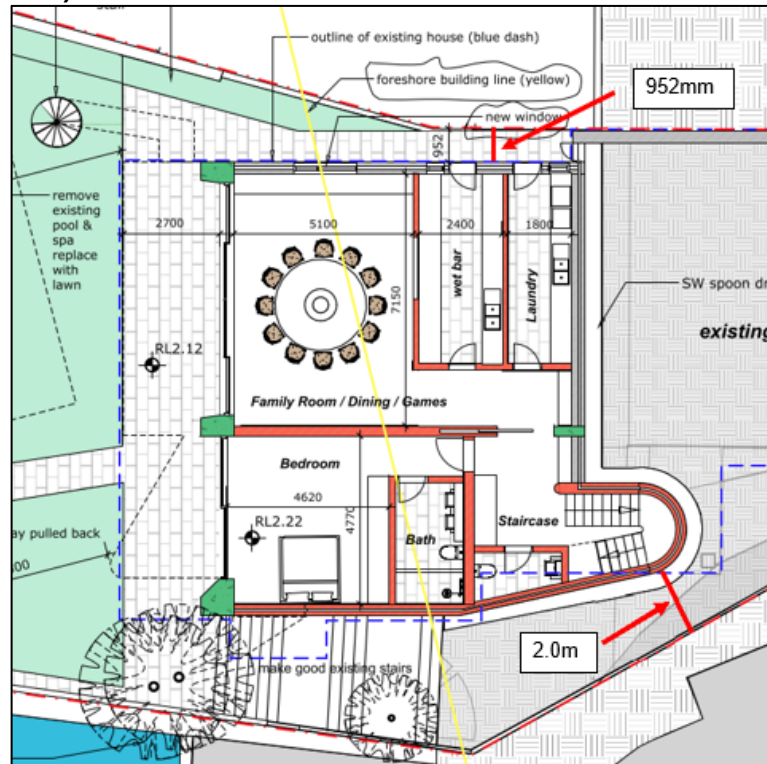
Side setbacks notated on lower ground floor plan (blue dotted line shows outline of existing house)
